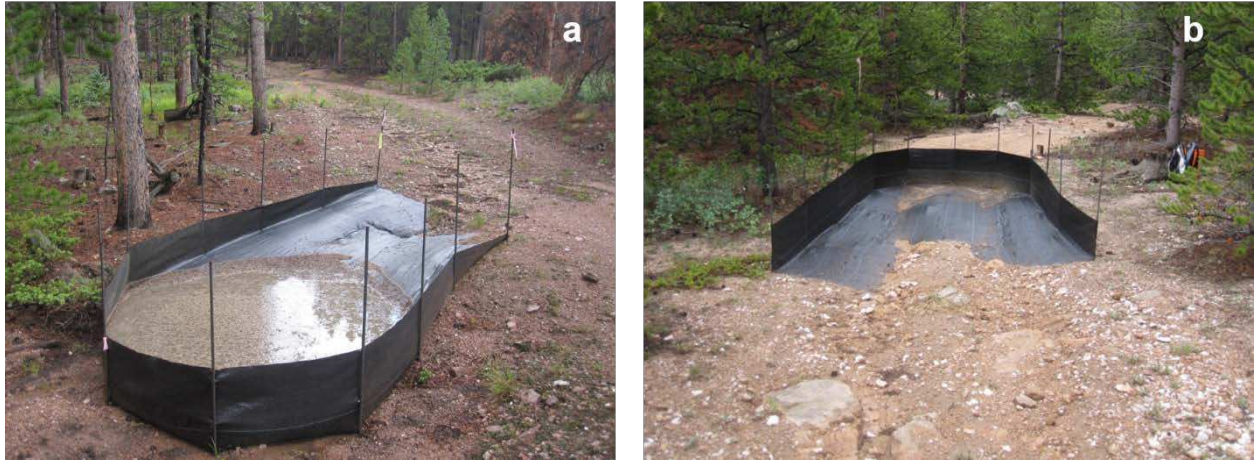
Sediment fence at a drainage outlet (a) and on the road surface (b).
